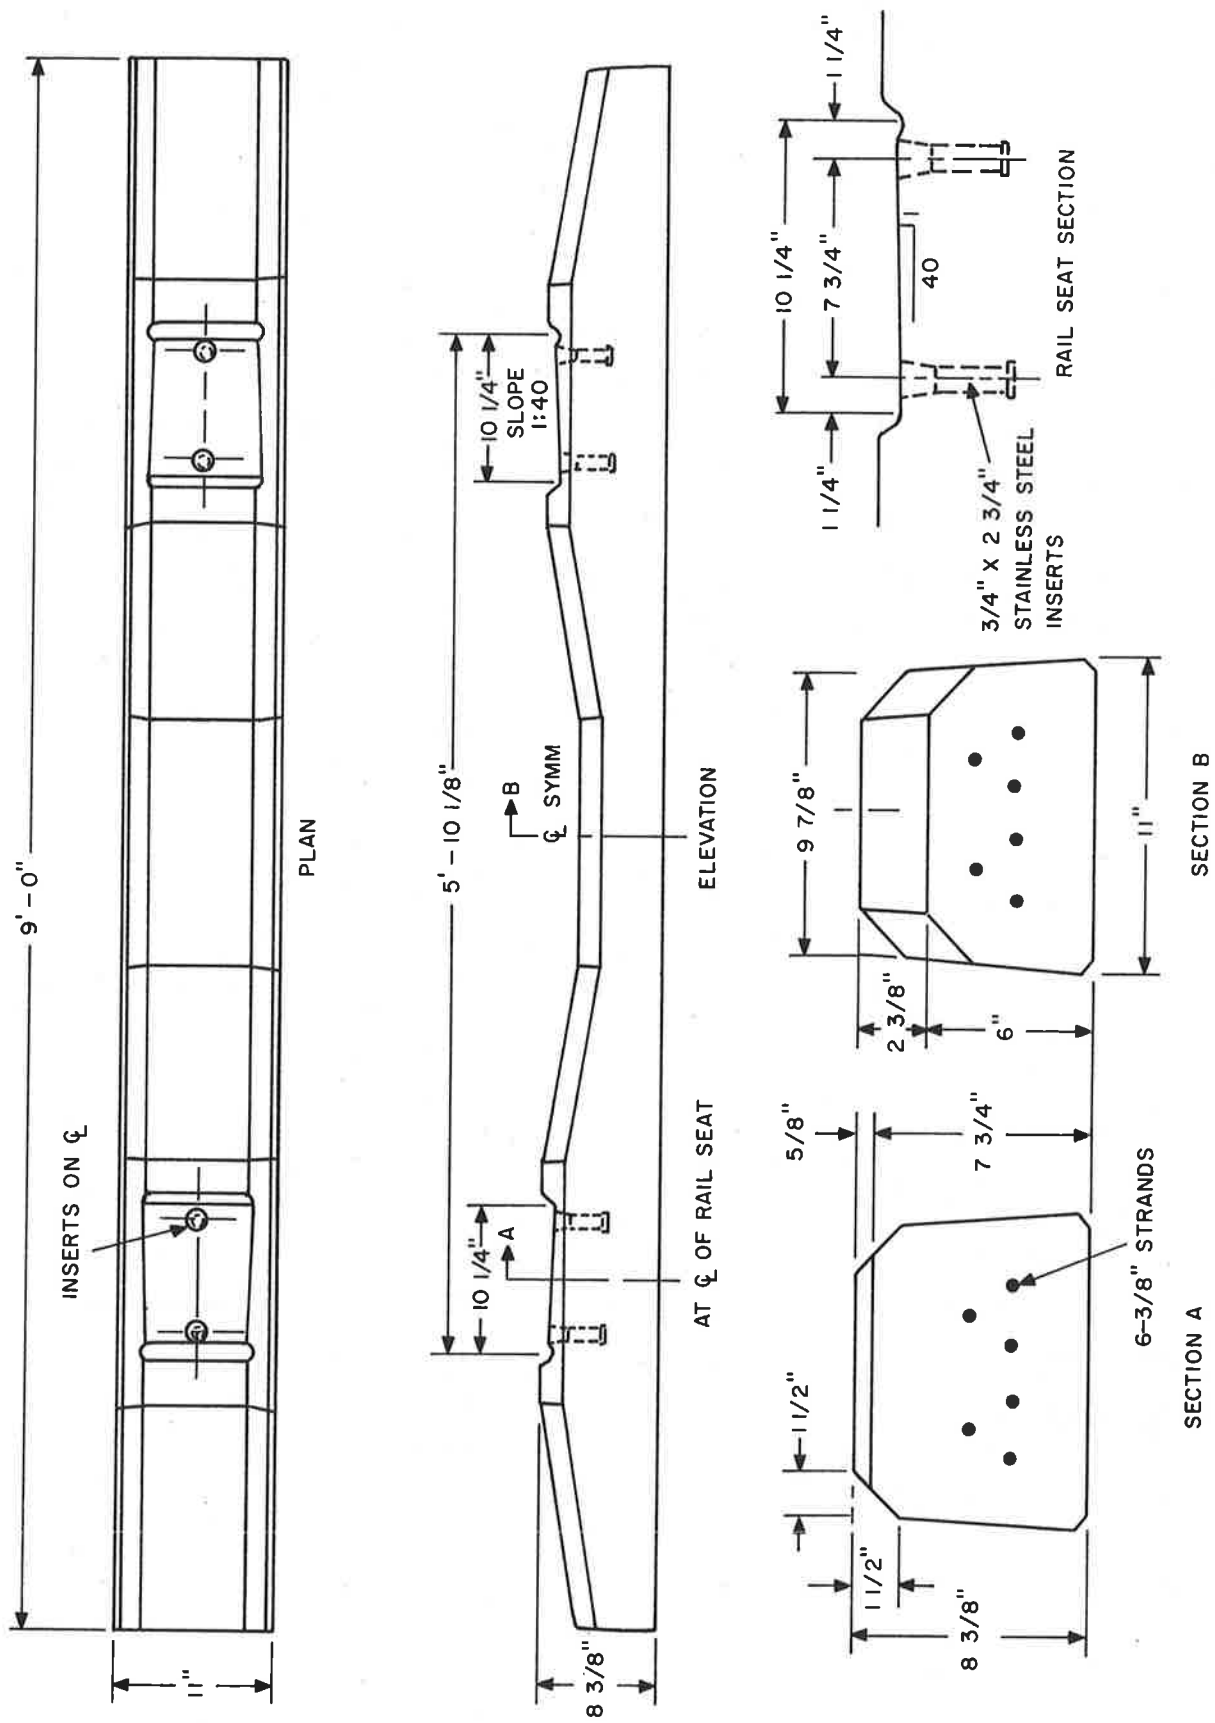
CONCRETE CROSSTIE CONFIGURATION - GERWICK RT-7 MARK 38
